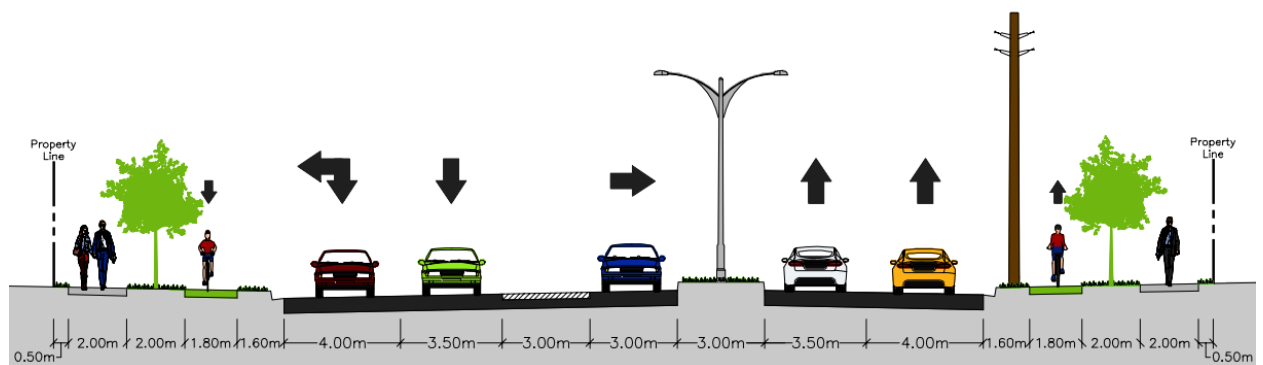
Preferred Richmond Street Cross-Section, North of Fanshawe Park Road
